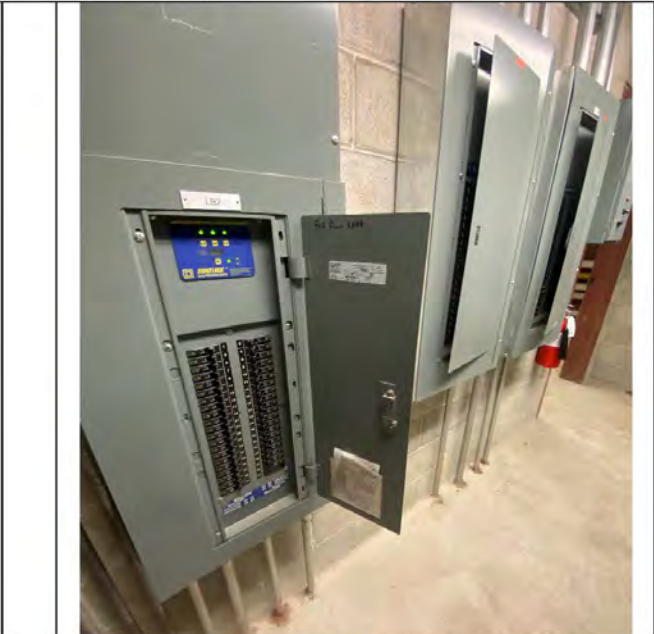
Typical Branch Panelboards in Building Area "B"
